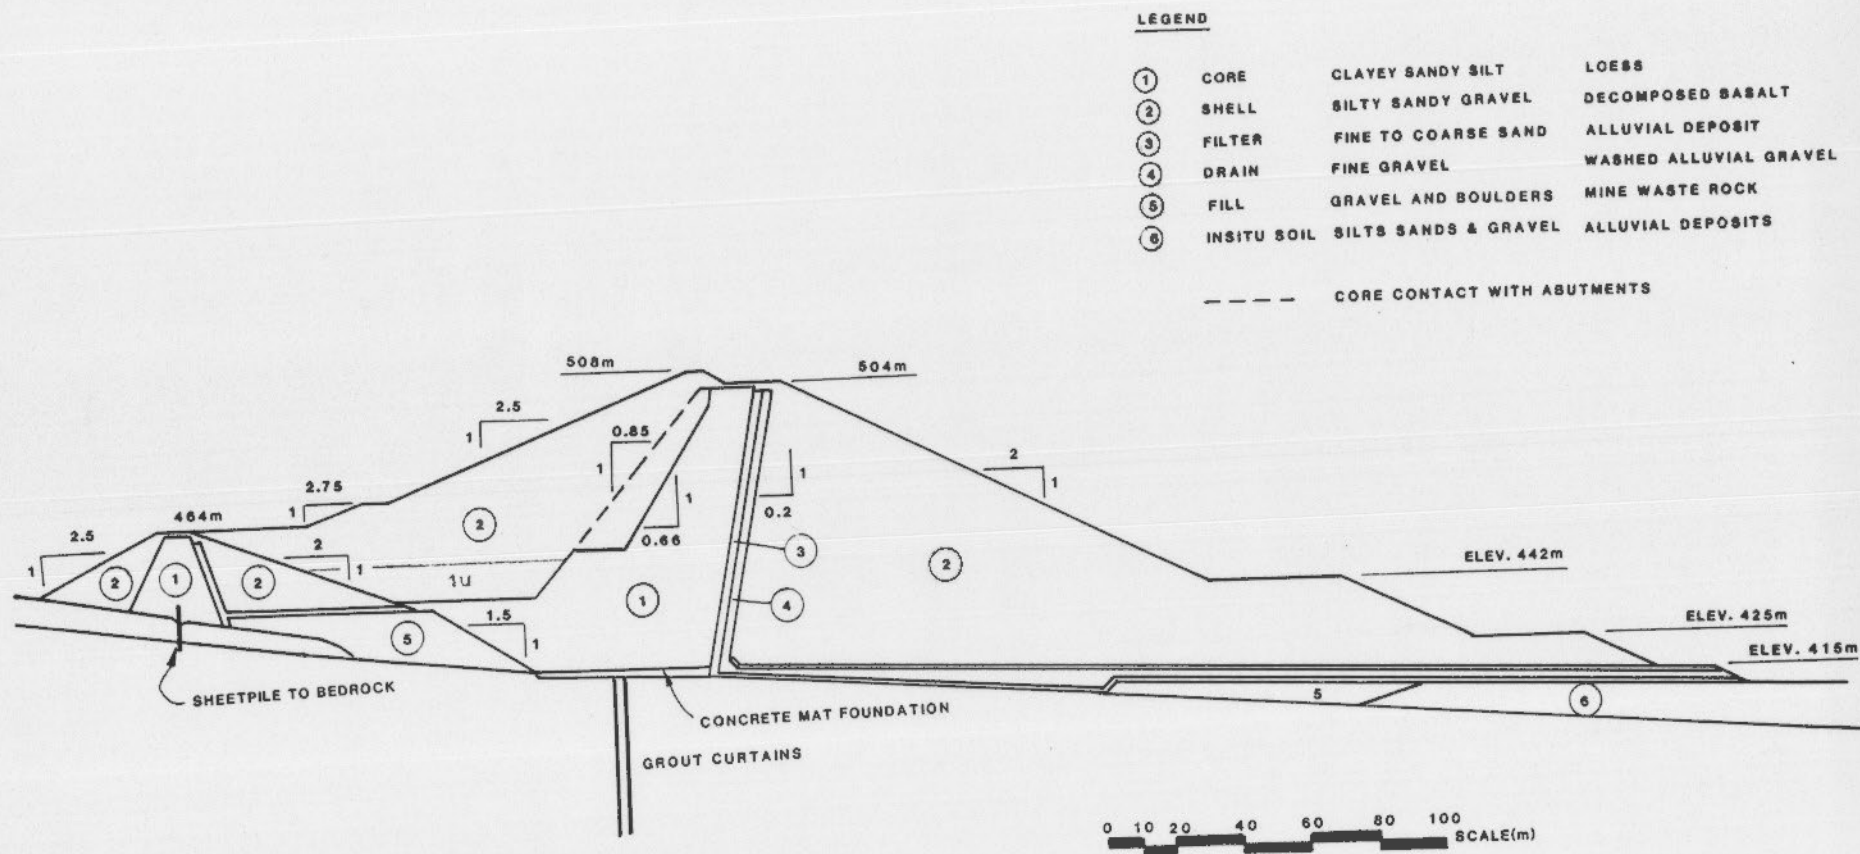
FINAL CROSS SECTION OF EMBANKMENT AS BUILT
